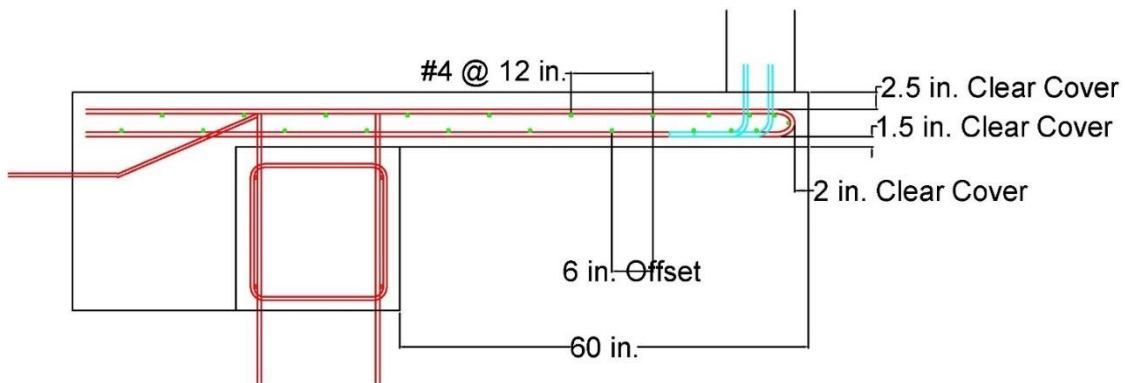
Option 3, Bridge Deck Overhang Cross Section
